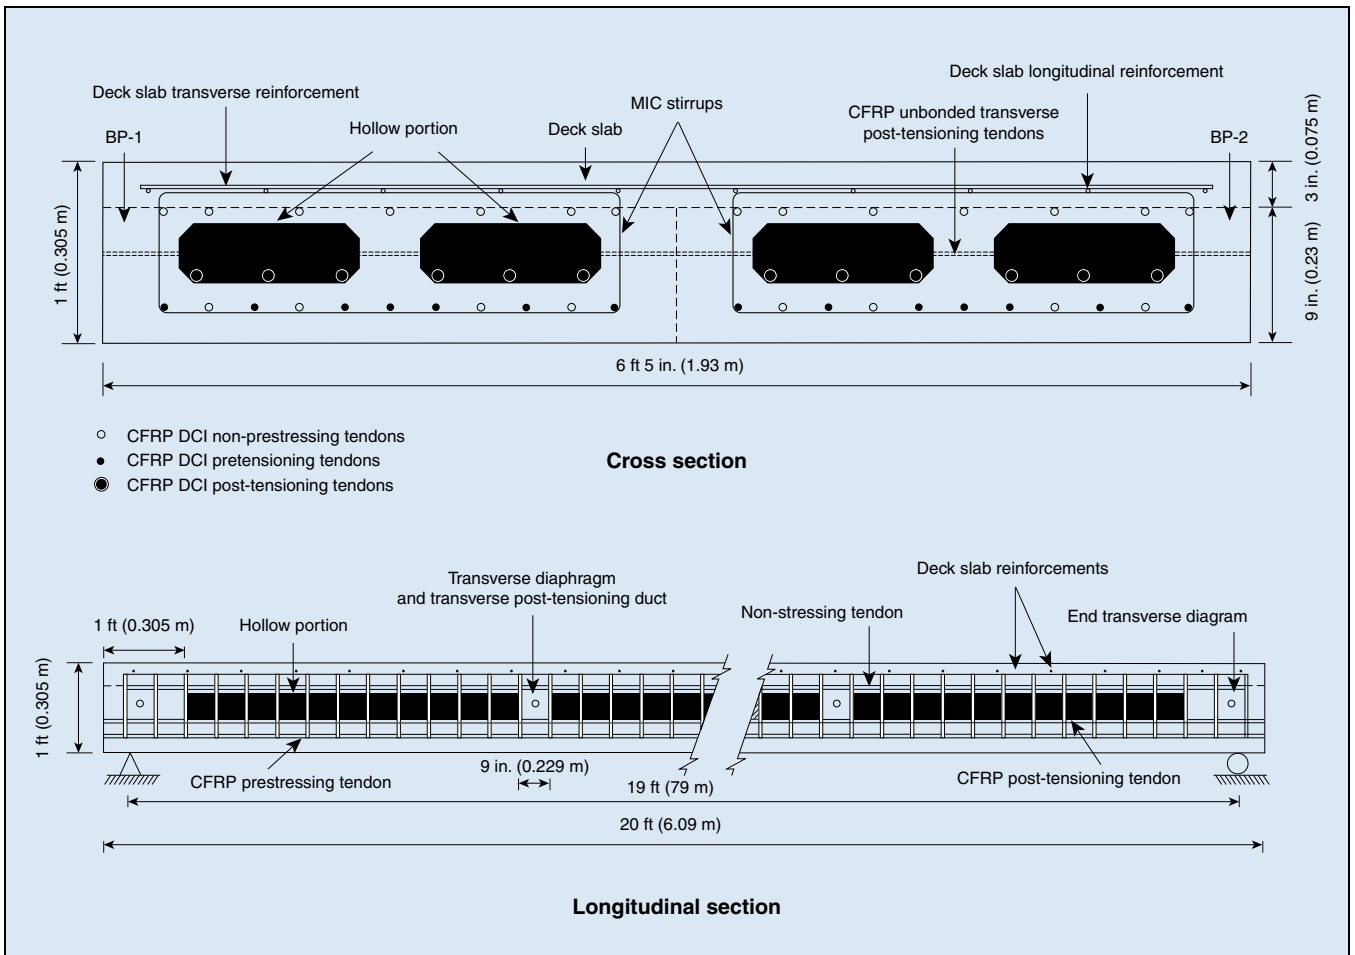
Cross-section details and longitudinal section of BBD-I. Note: 1 ft = 0.305 m; 1 in. = 25.4 mm.
